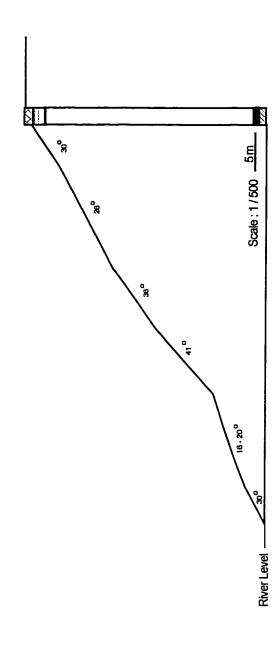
Longitudinal Profile, P-16 C, at Loc. 16, (looking downstream)
